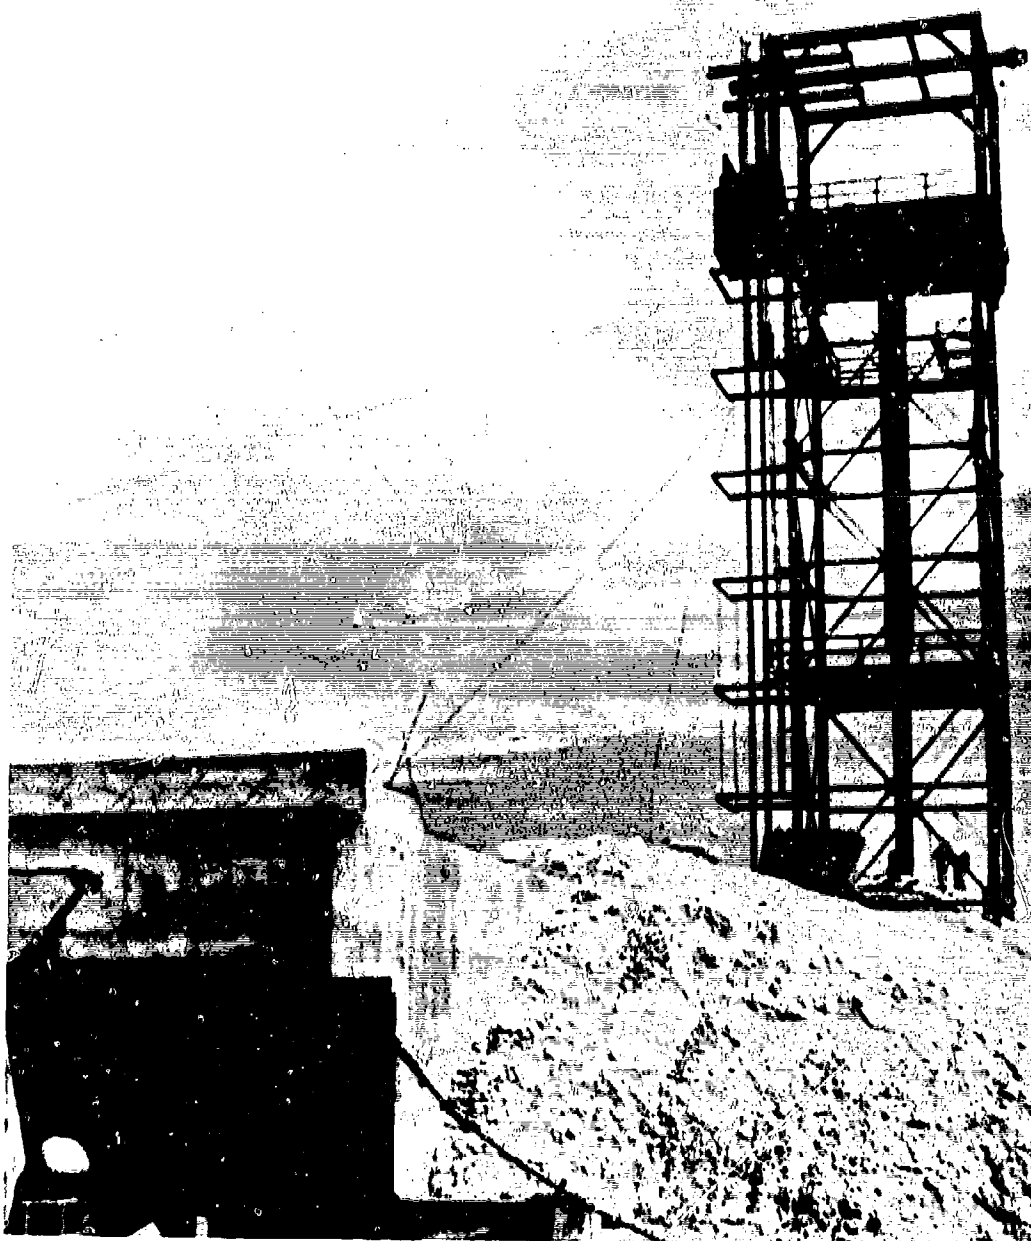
Tower Station T-7c and Base Structure Station 7-313
